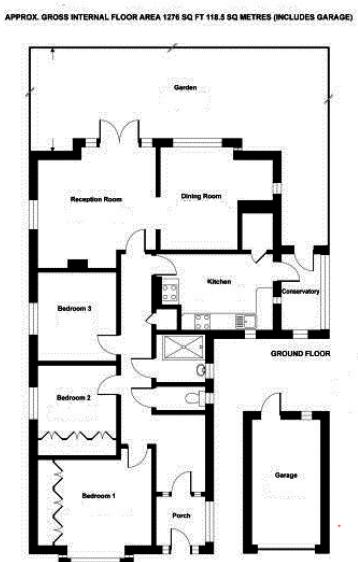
Floor plan of No.3 Crofton Lane (Credit from Rightmove)
